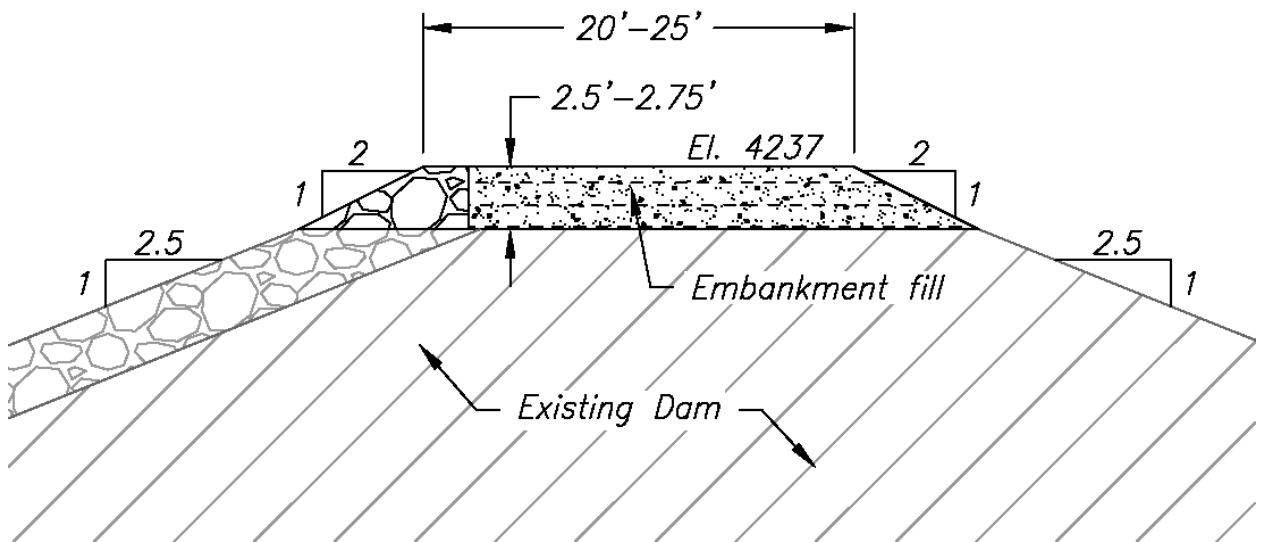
Typical cross section of crest raise from Station 17+00 to 60+00
